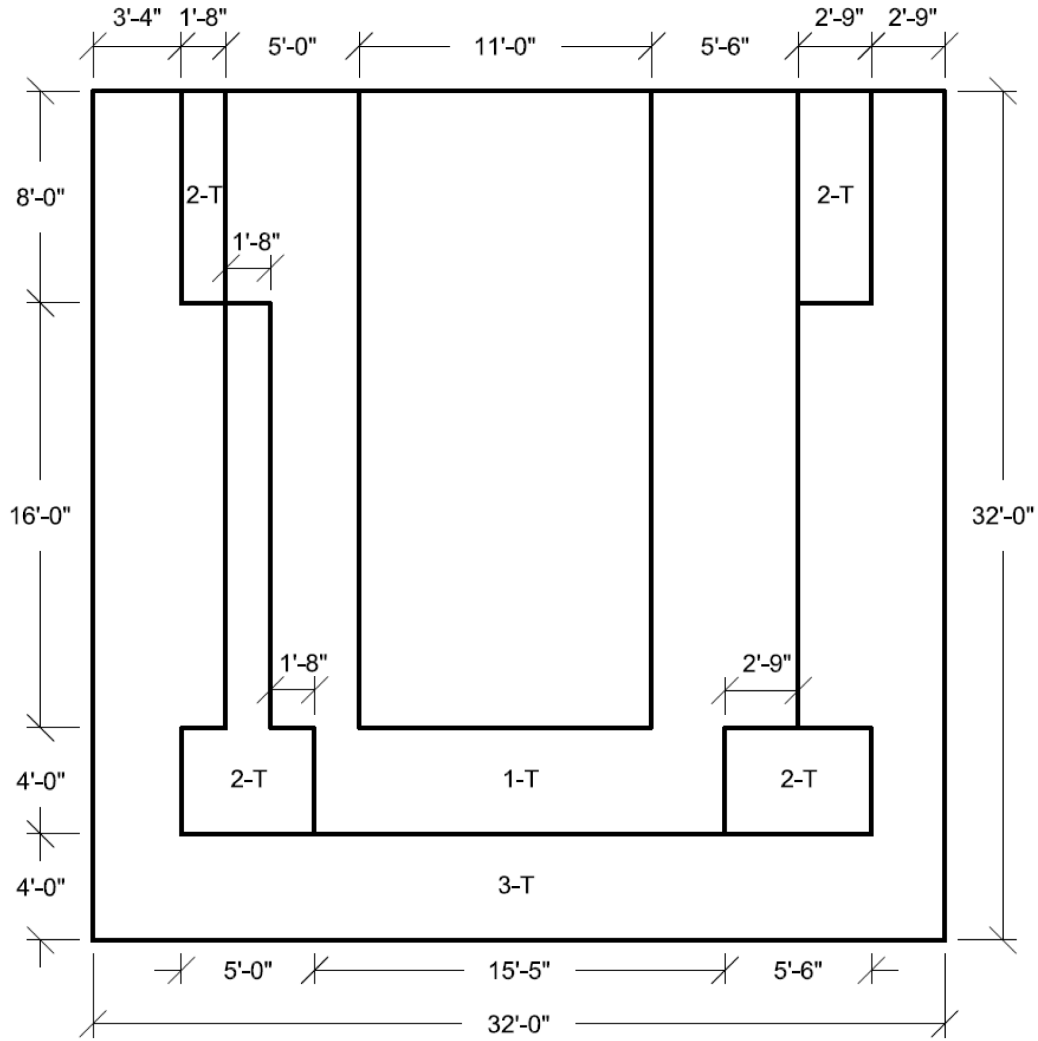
H.6-194 DGFOV Wall 13 Looking From Outside Transverse Reinforcement Zones
